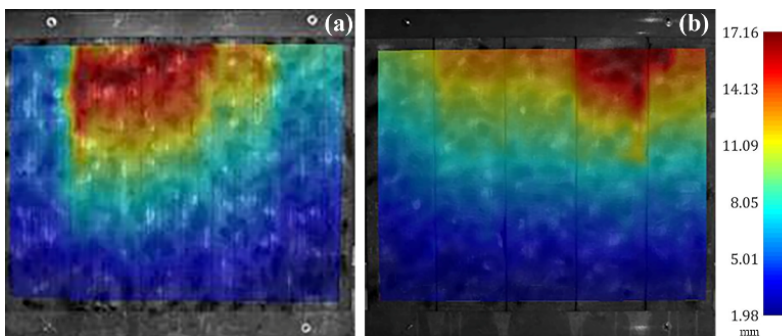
Out-of-plane displacements highlighted through DIC: (a) fir board reinforced specimen and (b) GFRP reinforced specimen
